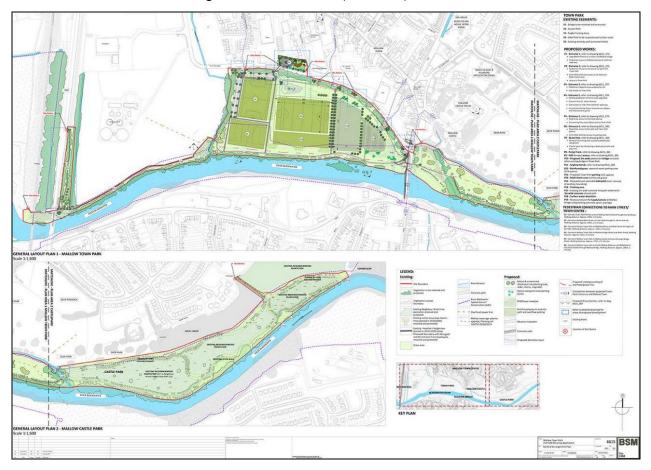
General Arrangement Plan of Proposed Improvement Works.
